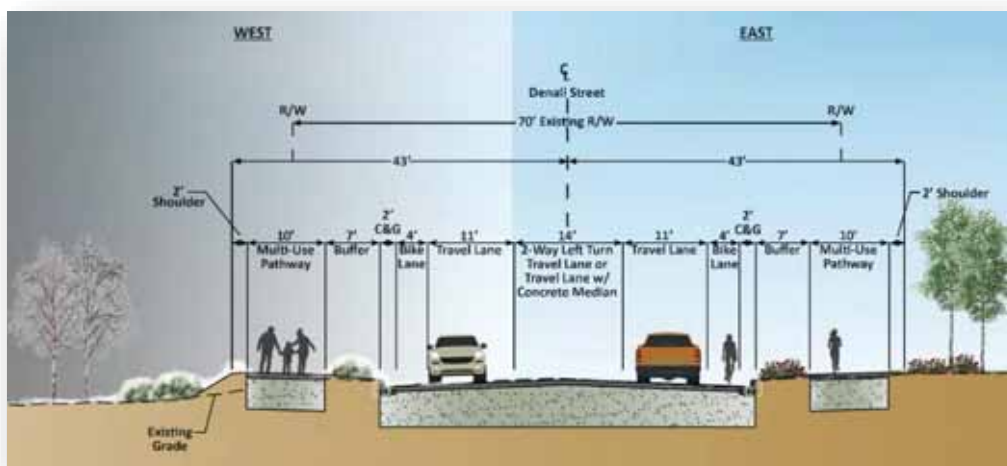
Denali Street (Tudor Road to 36th Avenue) – Alternative 1
